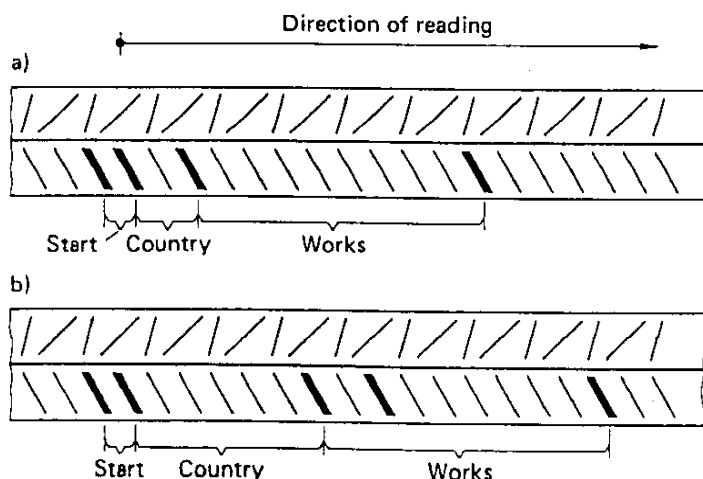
Labelling of reinforcing steel bar grade BSt 500 S
